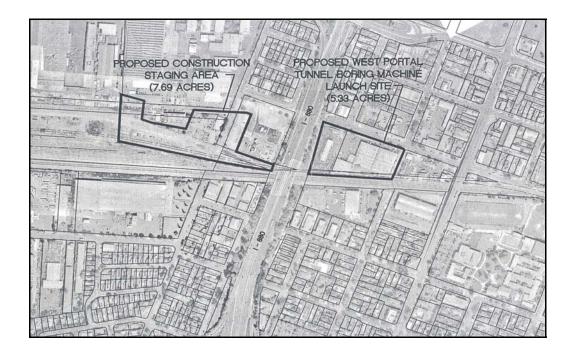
Construction Staging Site on Either Side of I-880 East of Rail Corridor
